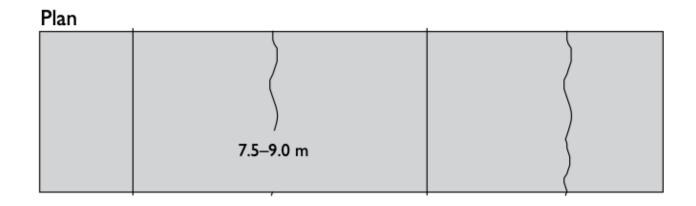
Jointed reinforced concrete pavement (JRCP) (courtesy: ACPA).
